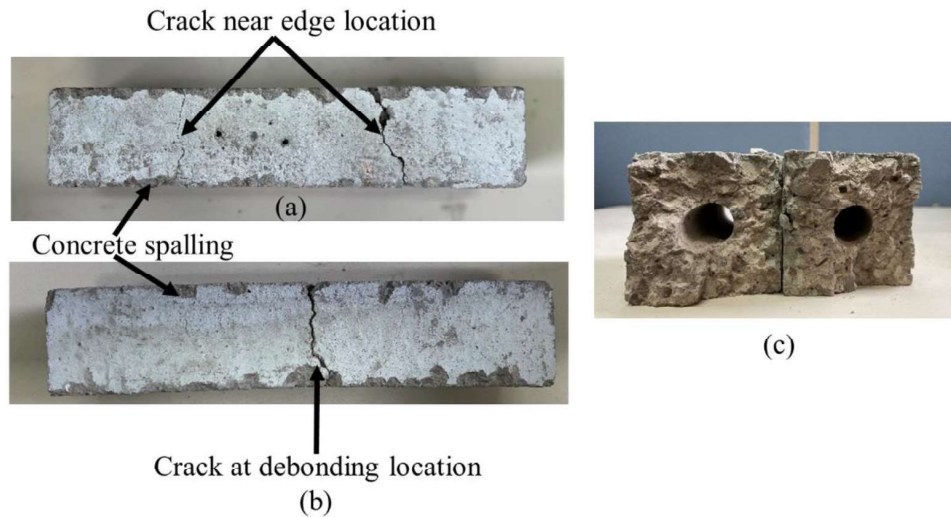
Crack pattern for (a) bonded and (b) debonded specimen type, (c) concrete cross-section at cracked location
